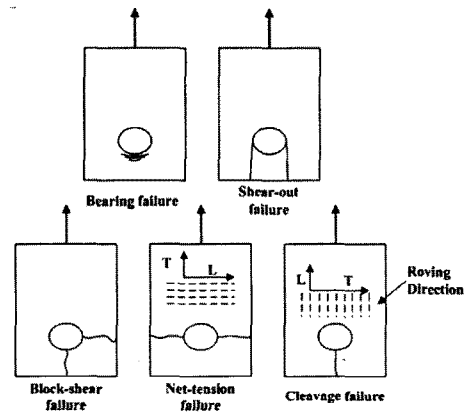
Failure modes of single-bolt lap-joint in-plane connection.
